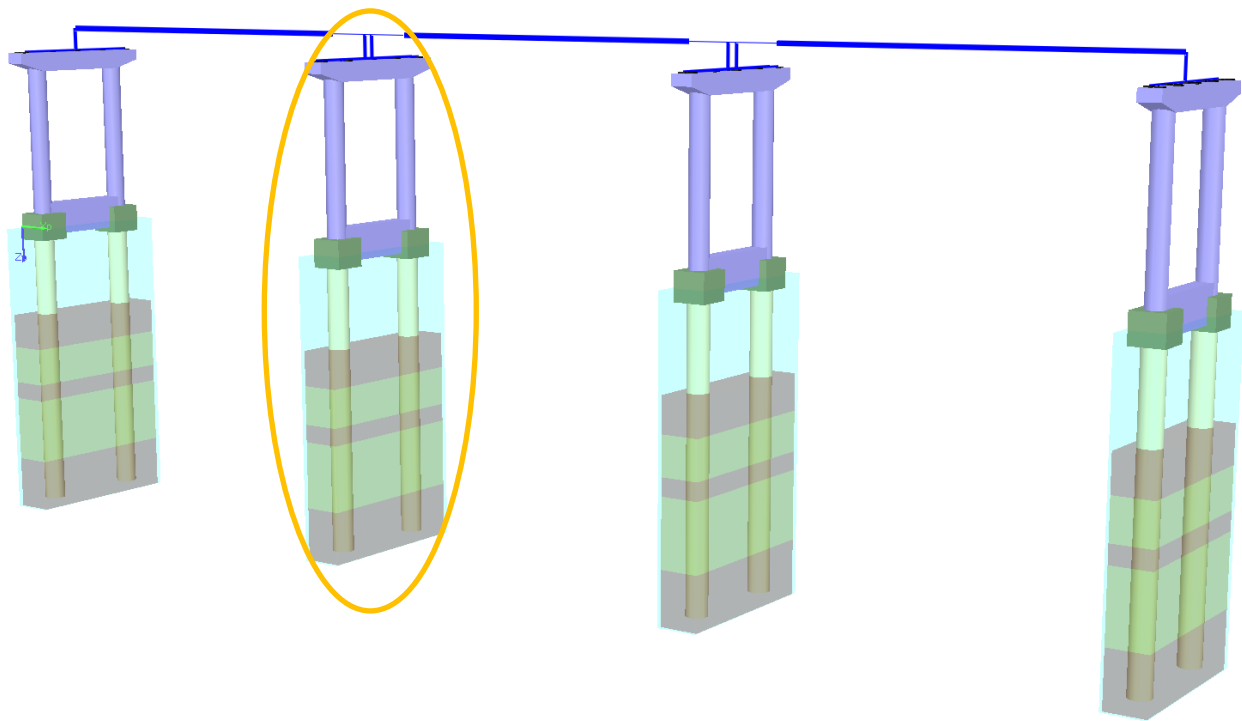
Four-pier three-span bridge model used for demonstration
